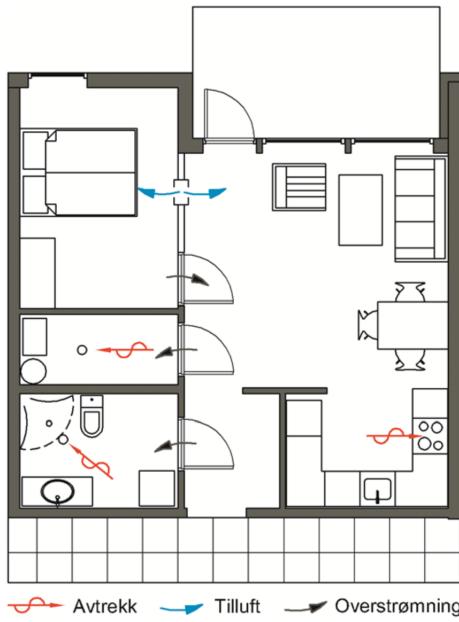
Example of an apartment with open plan solution and a balanced ventilation system [9].
